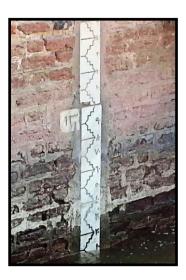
One of the Nilometers located at the wall of the pavement between the lock and the Bagouria barrage.
